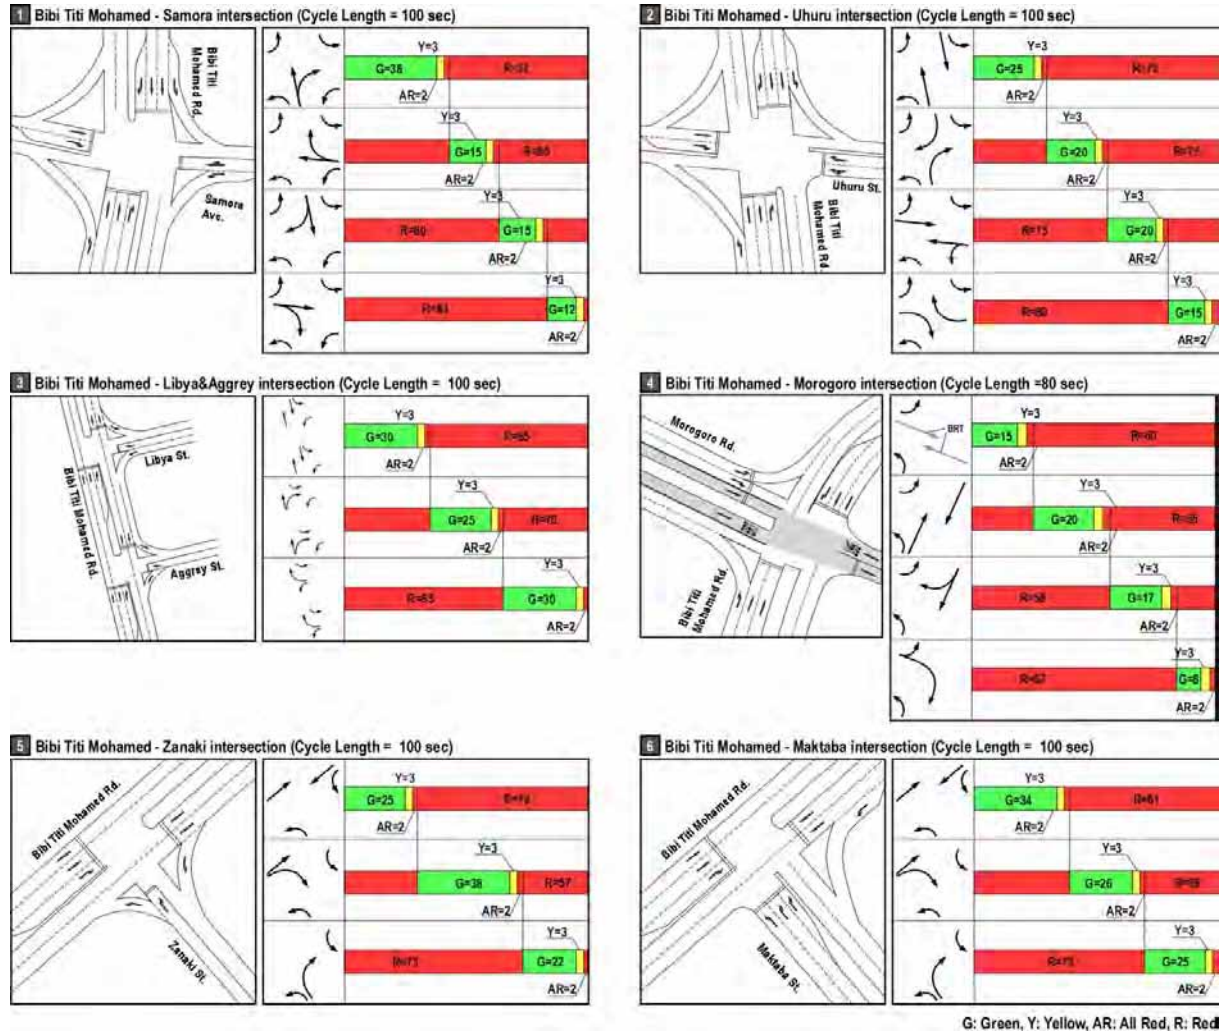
Intersection Improvement Plan (Part 1 of 2)
